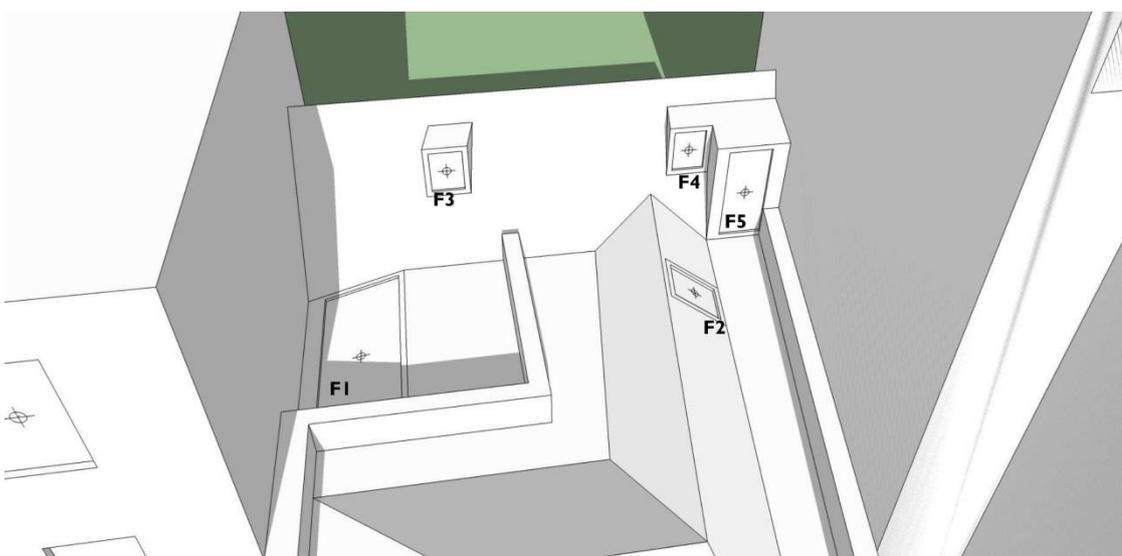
Existing Windows on top floor flat (Block F) No. 160 Finchley Road
